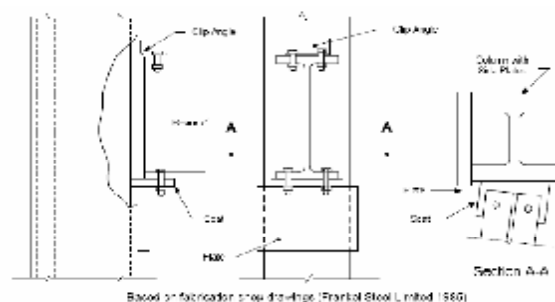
Seated connection to column 79 in WTC7 (FEMA 2008)
